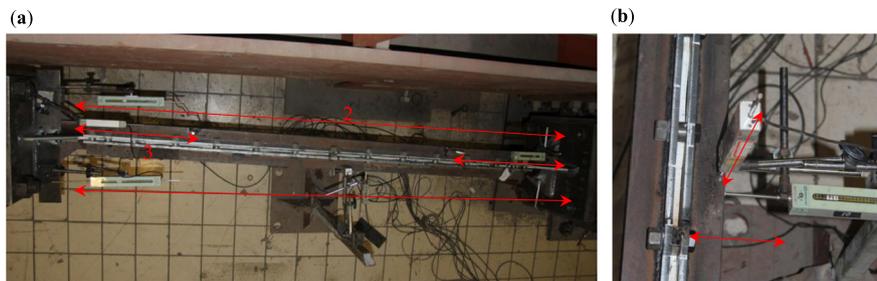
Layout of LVDTs: (a) LVDT1-4; (b) LVDT5-6
